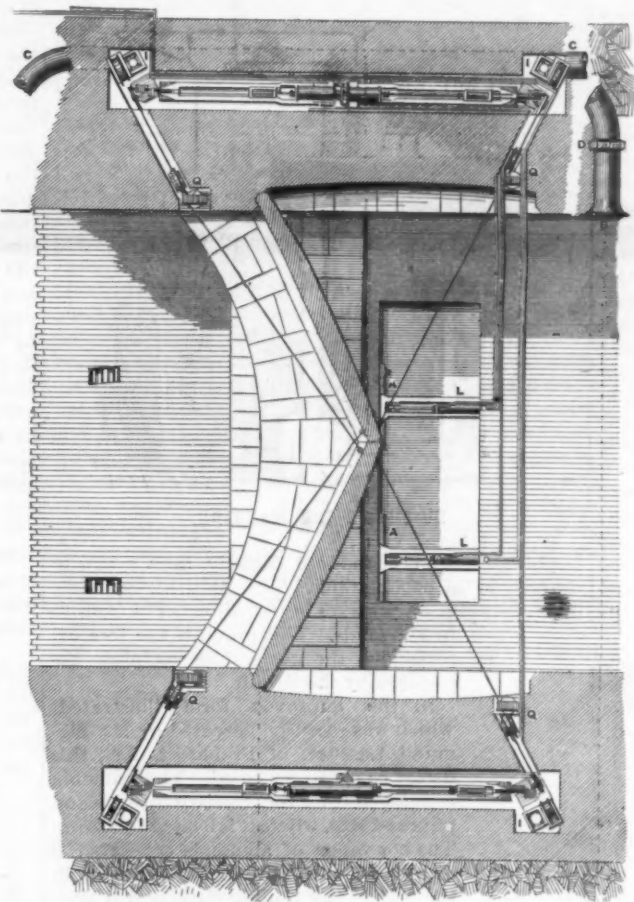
PLAN OF UPPER LOCK GATE SHOWING OPERATING MACHINERY.
